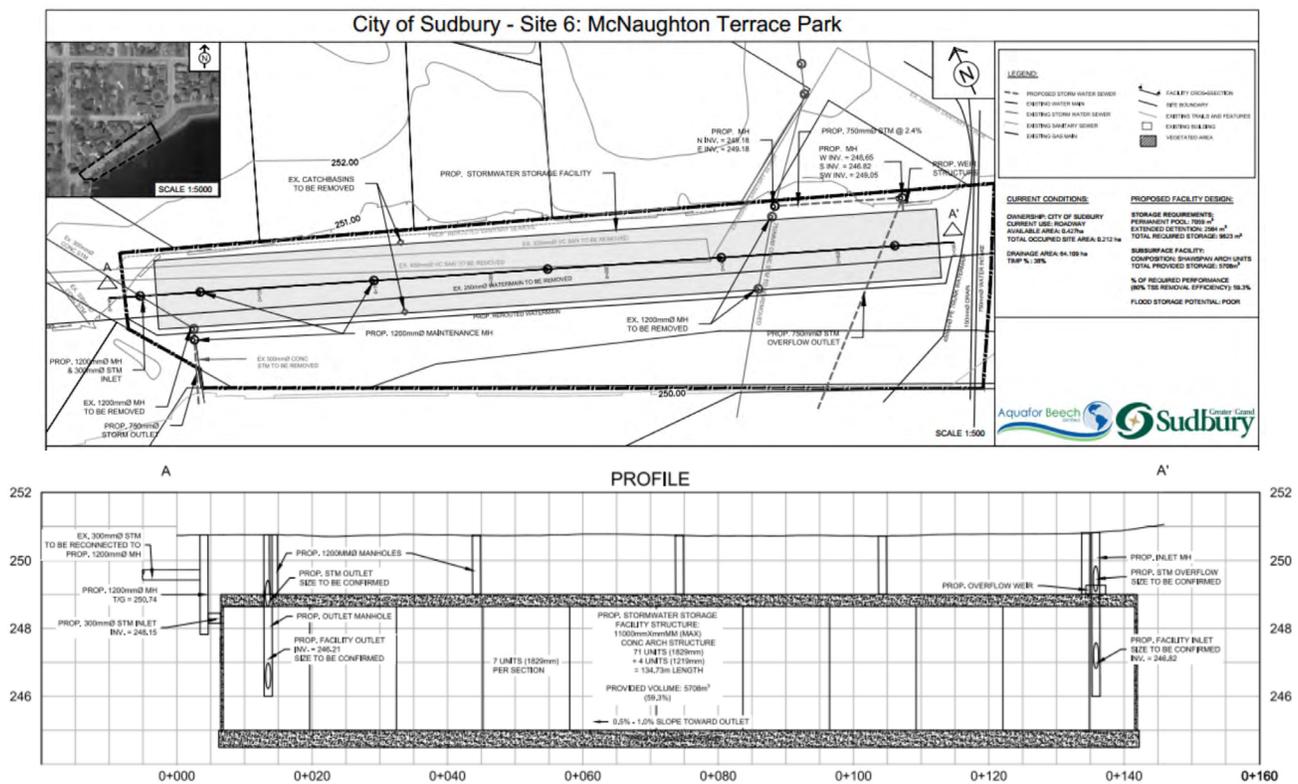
| The City of Greater Sudbury’s proposed stormwater management facility on McNaughton Terrace Park, site 6
